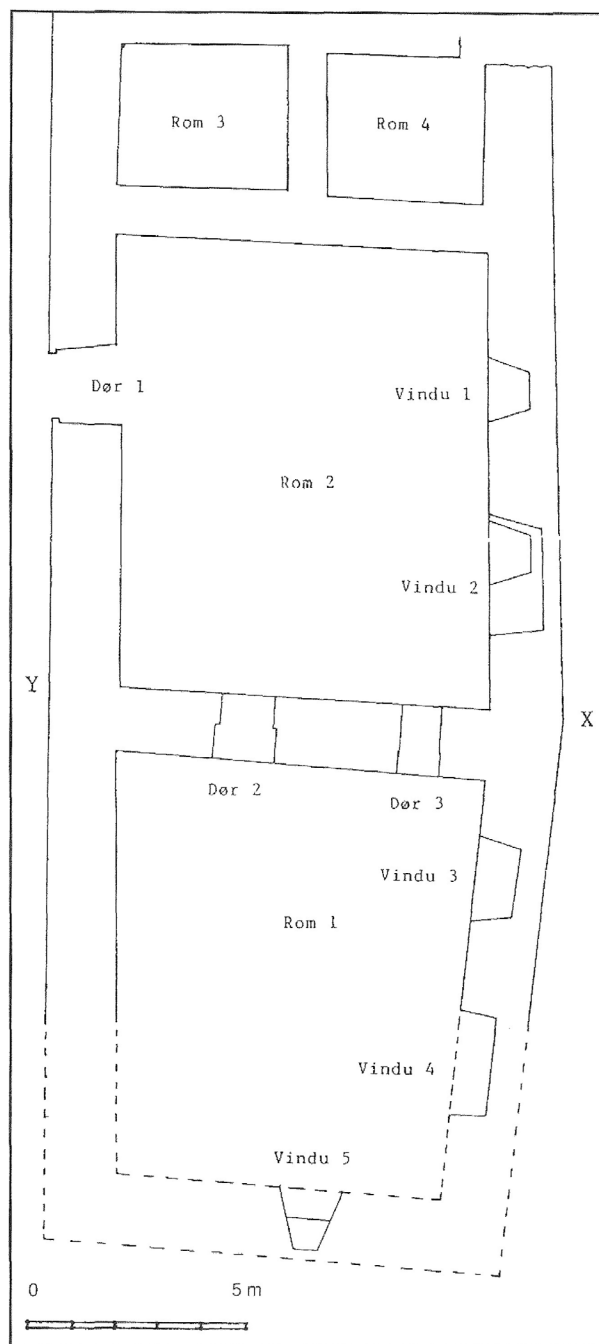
Sketch plan of the excavated stone building. After: Ekroll 1990: 31.
